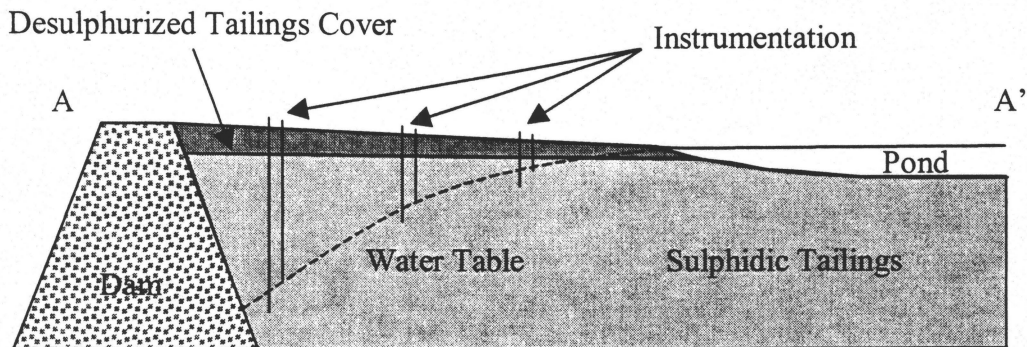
Schematic profile (A-A') through the Detour Lake tailings (not to scale).
